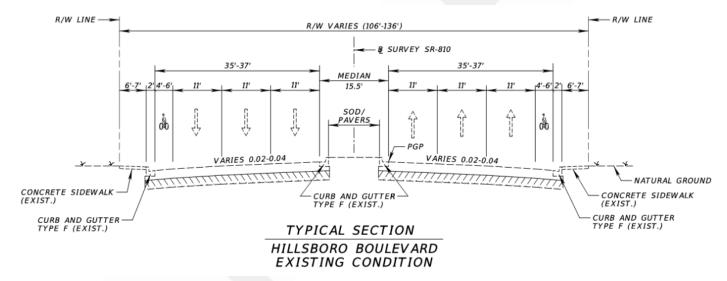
4: Existing Typical Section - Hillsboro Boulevard
